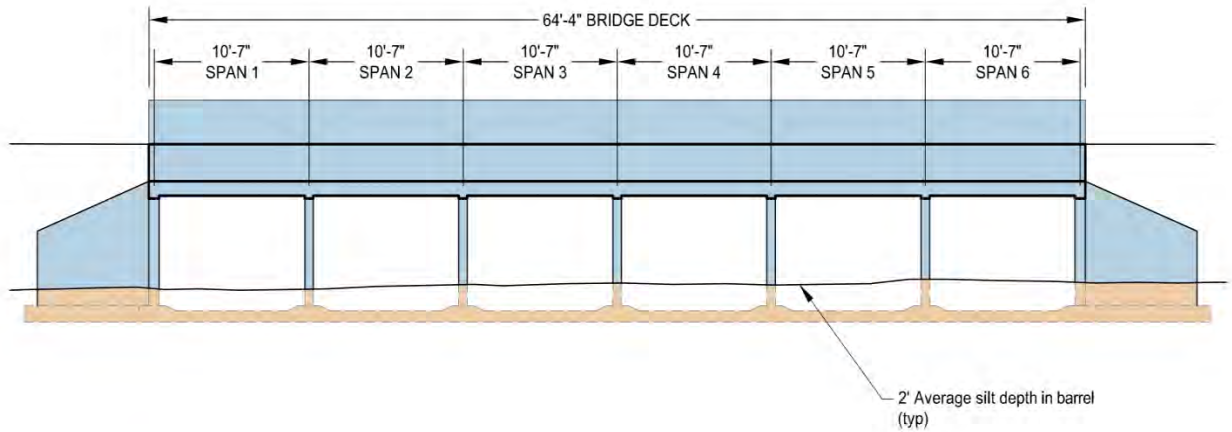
EI.24.11- 1: Elevation view of a multi-cell reinforced concrete culvert.
